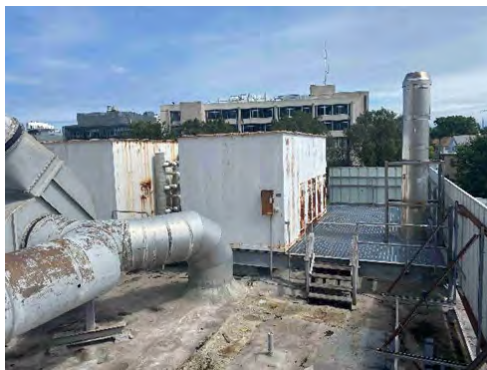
Ward Street Headworks Make-Up Air Handling Units
